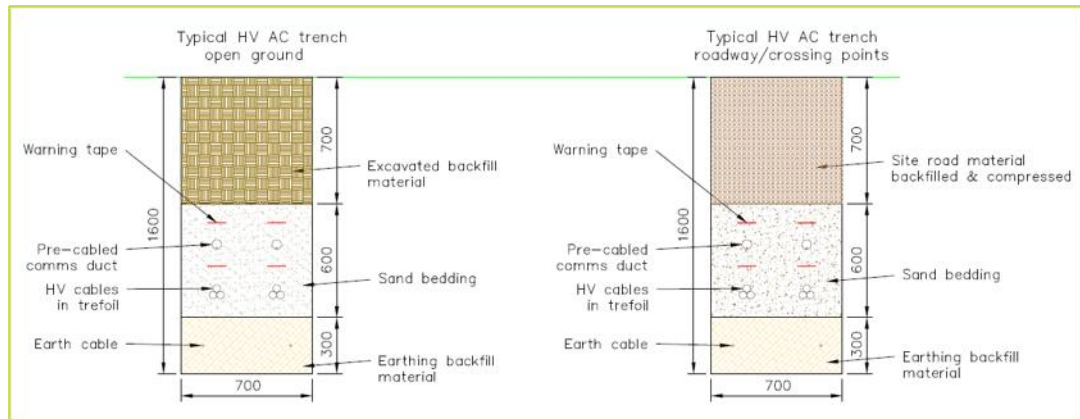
Indicative Grid-Connection Cable Trench Cross-Section
